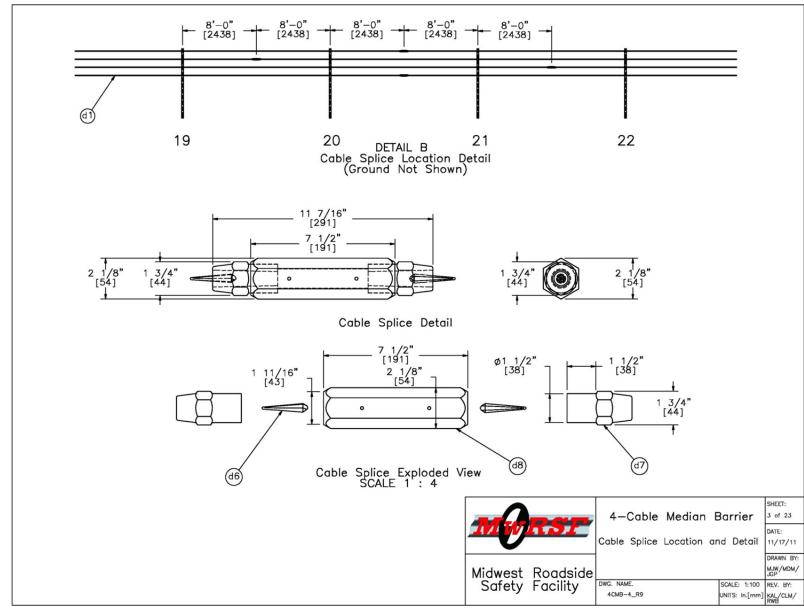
Cable Splice Layout, Test No. 4CMB-4
